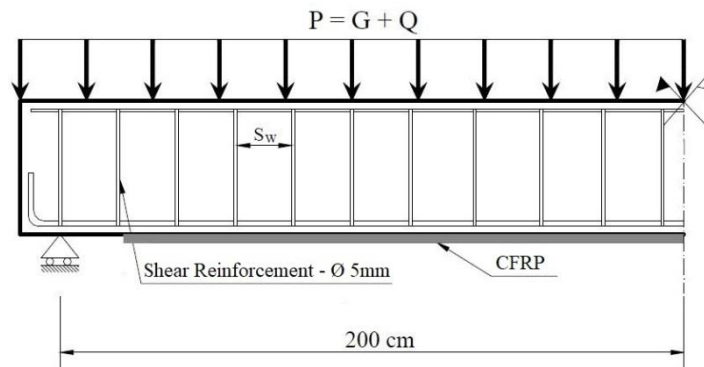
Lateral view of the beam (adapted from Paliga [9])
